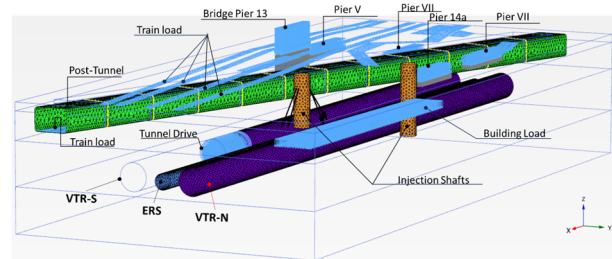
3D FE-Model - Dbb & PT: structural elements and loading
